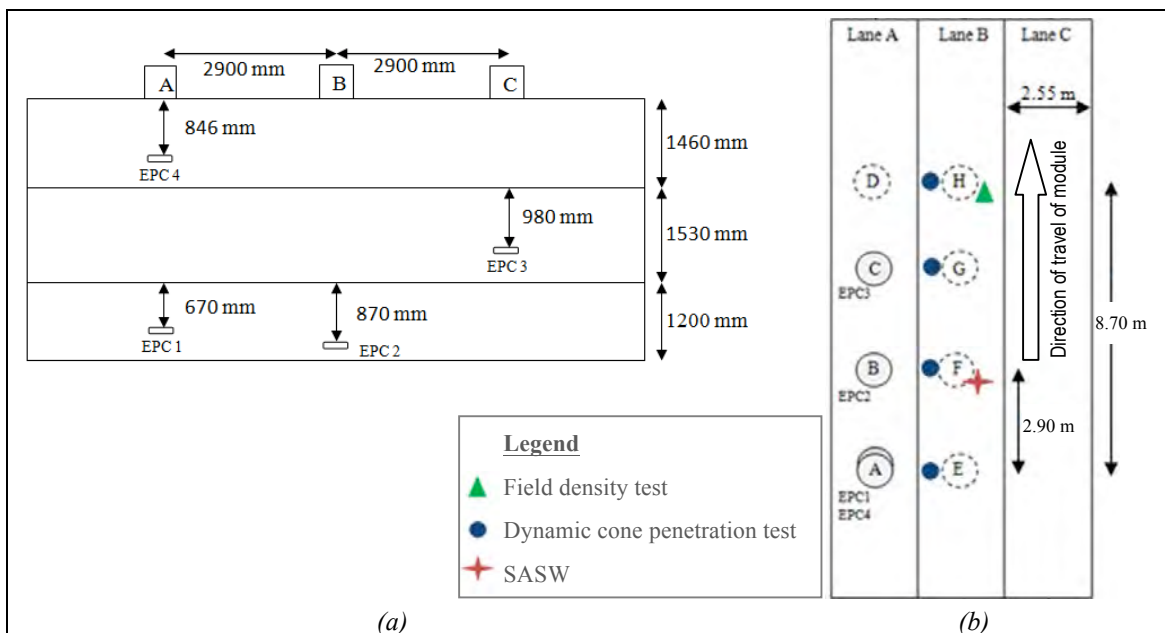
Details of test pad: (a) cross-sectional view, (b) plan view.
